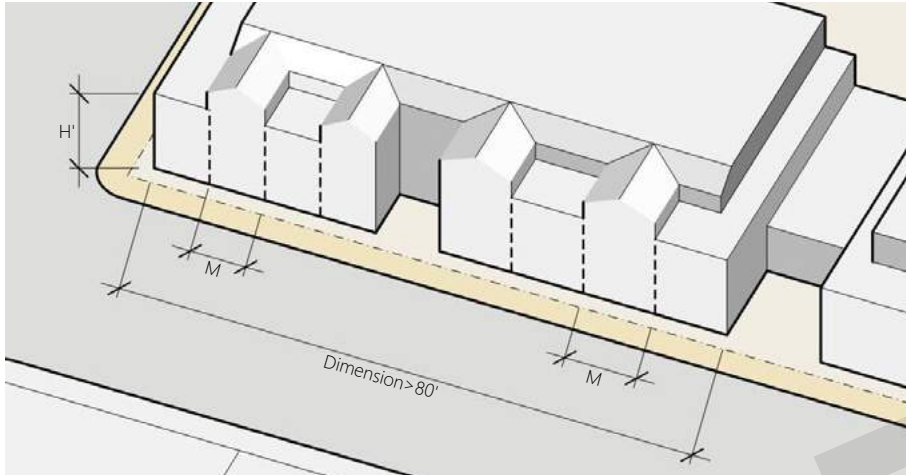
Residential buildings - Design façades with base, middle, and top, and articulate them with bays, plane changes, decks, and balconies.
